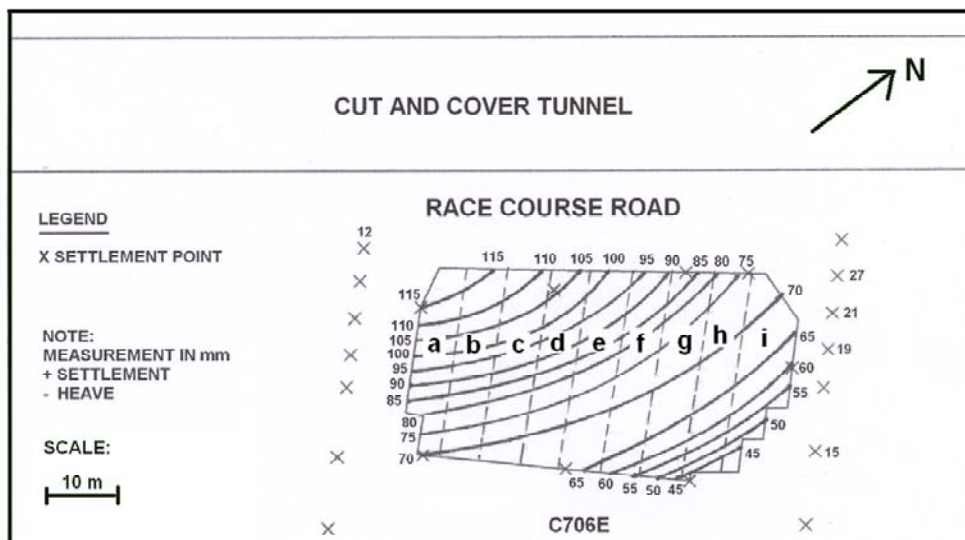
Building Settlement Contours at Shop Houses C706E
